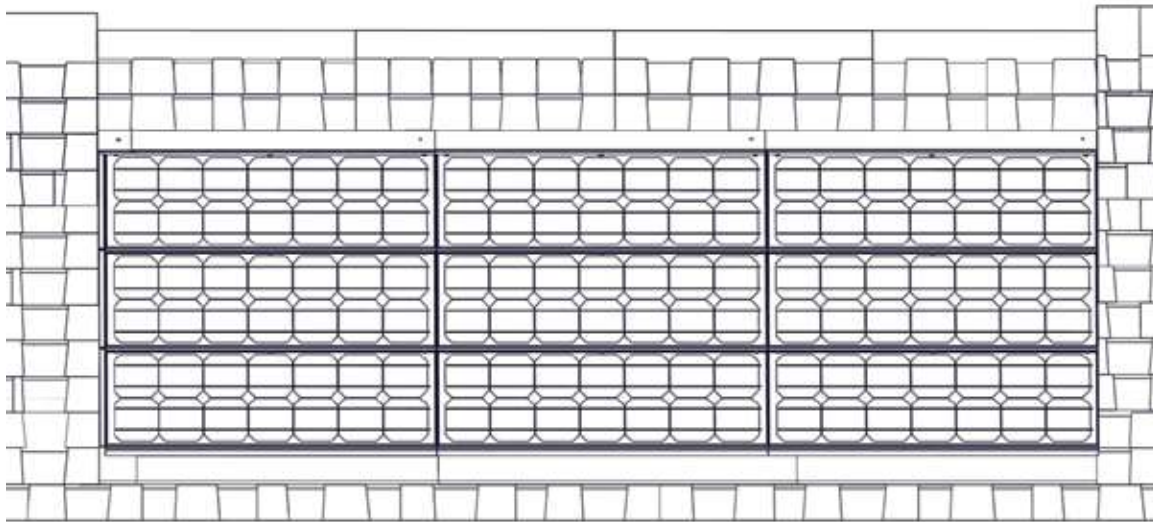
Illustrated example of completed Solstice® Shingle installation surrounded by asphalt shingles.
